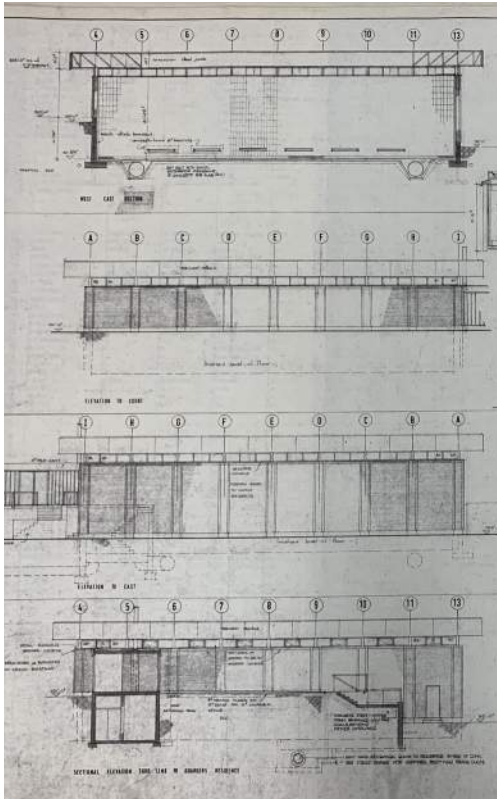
Section and elevations of Building D (T. V. Murray, 1964).
